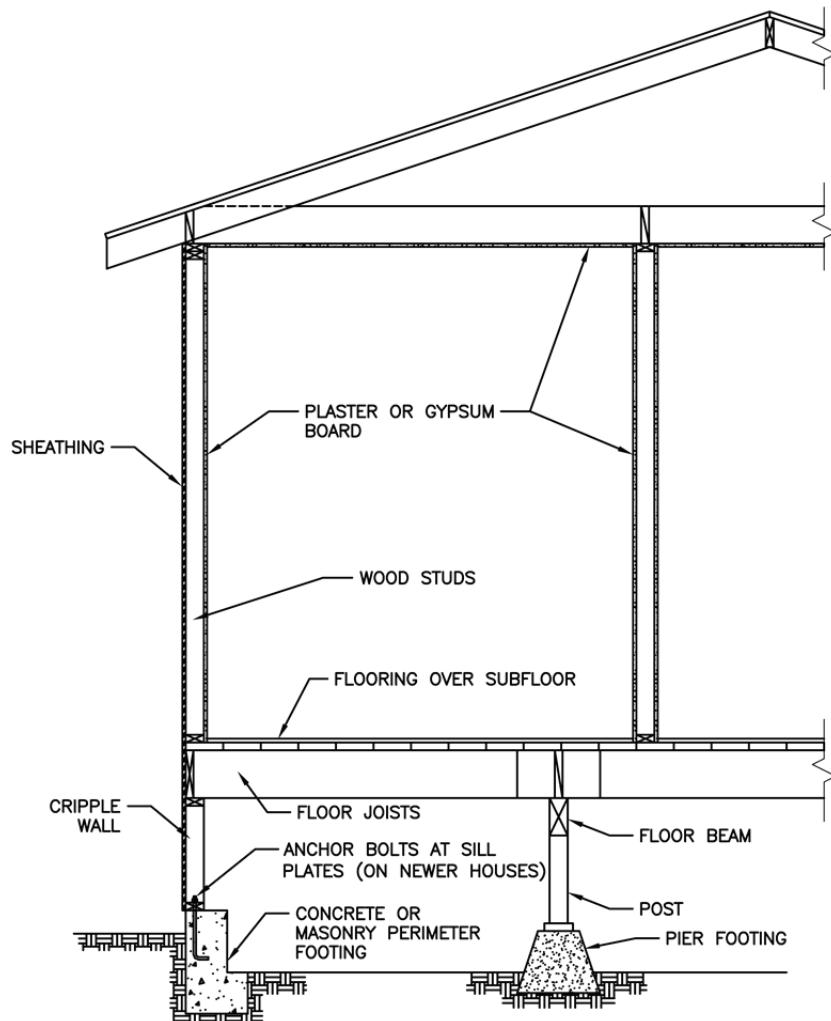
Section through typical cripple-wall crawl-space house (from ATC, 2002b).
